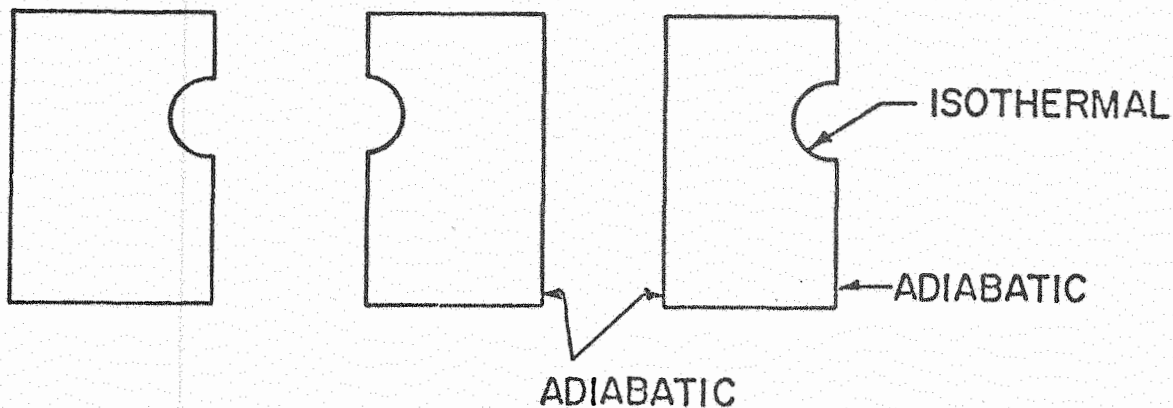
Subsections for mathematical model. These subsections can be added together to represent the bridge cross section.
